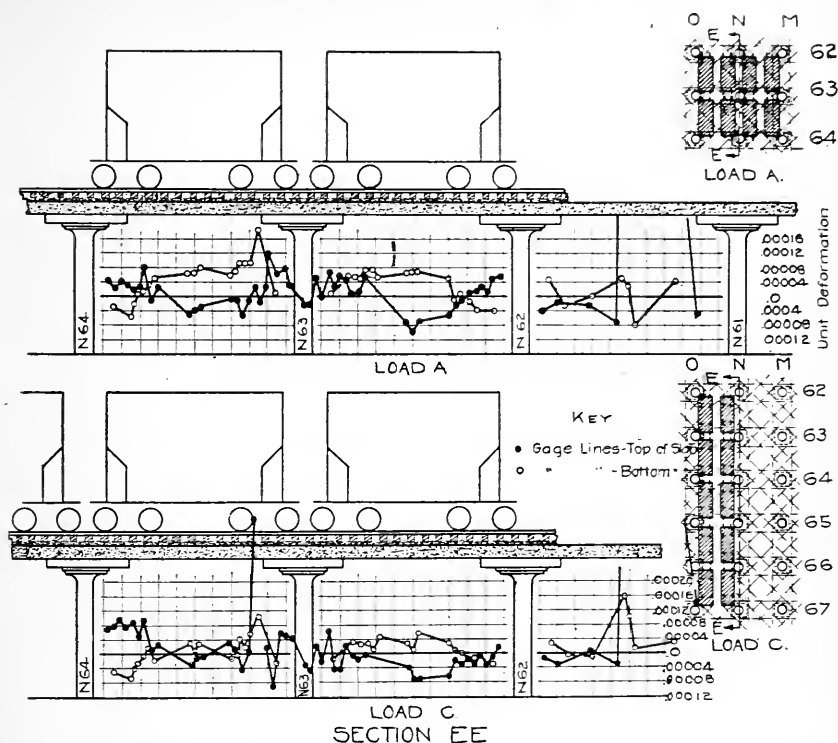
DEFORMATION ALONG SECTION E-E (PARALLEL TO TRACKS) OF 500 TERMINAL TEST FLOOR.
